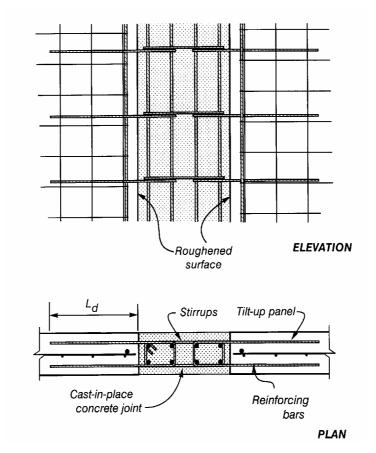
Vertical connection detail between walls: Connection with drop-in hoops
